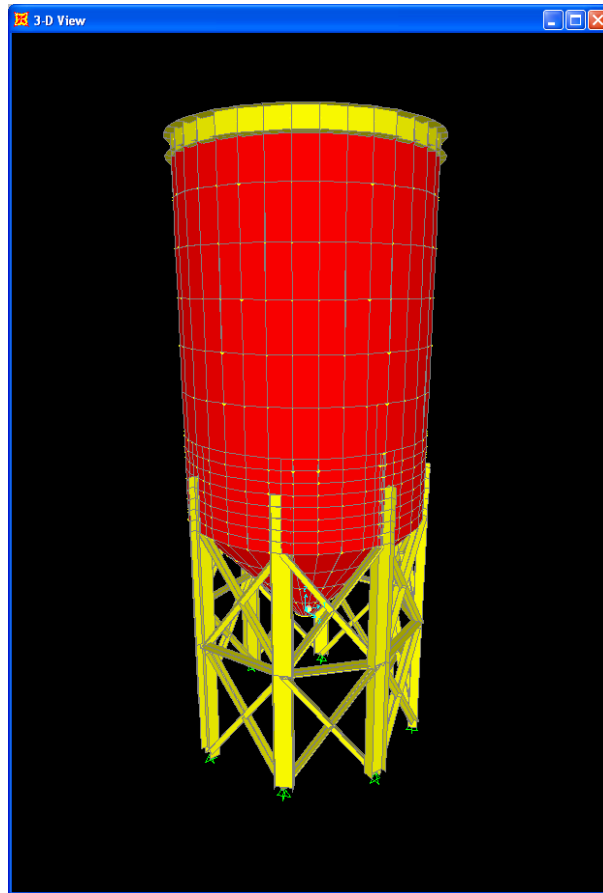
Reinforcement of the steel structure with additional columns and steel braces.
